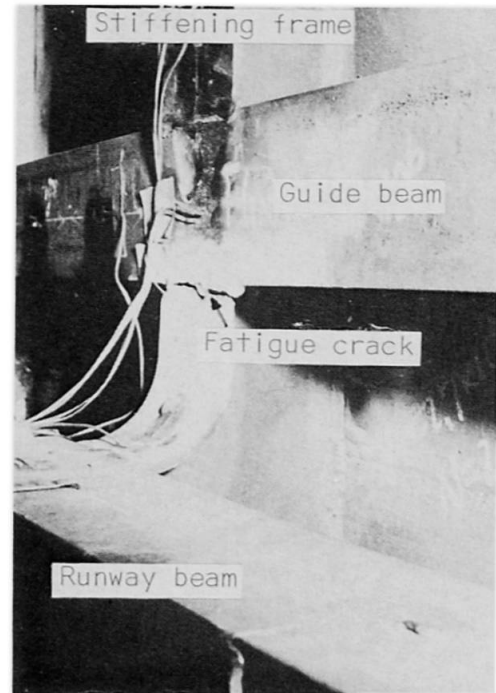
Fatigue crack initiation at stiffening frame corner
